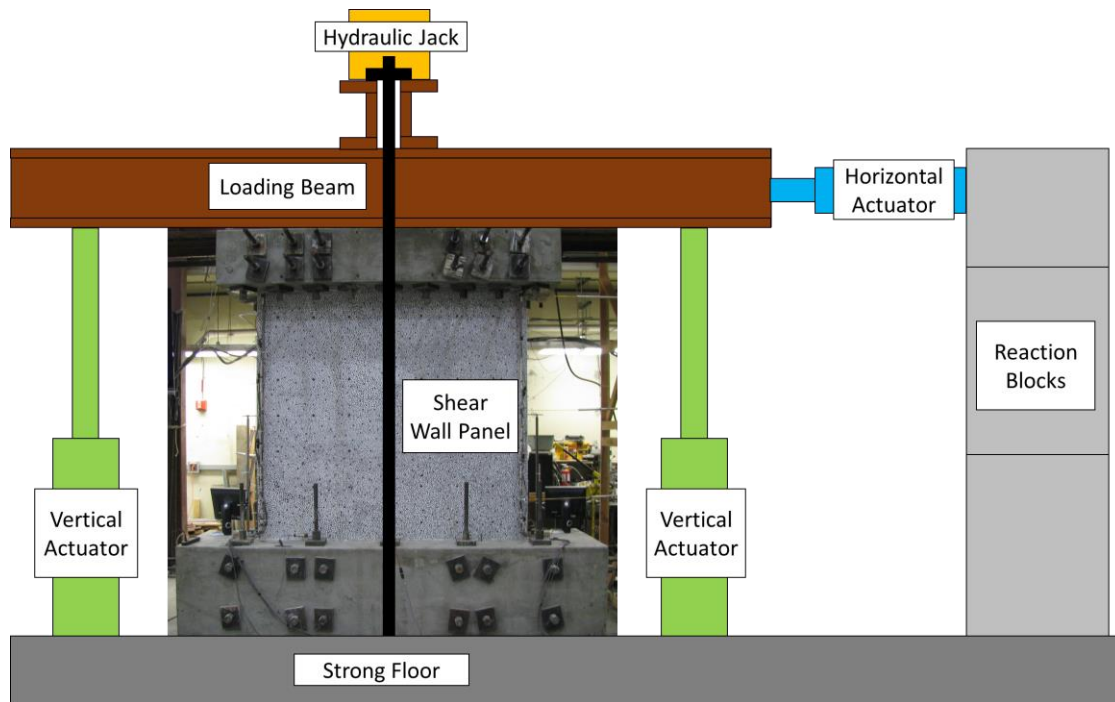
Test setup used for specimen WP1 (Segura and Wallace 2017)
